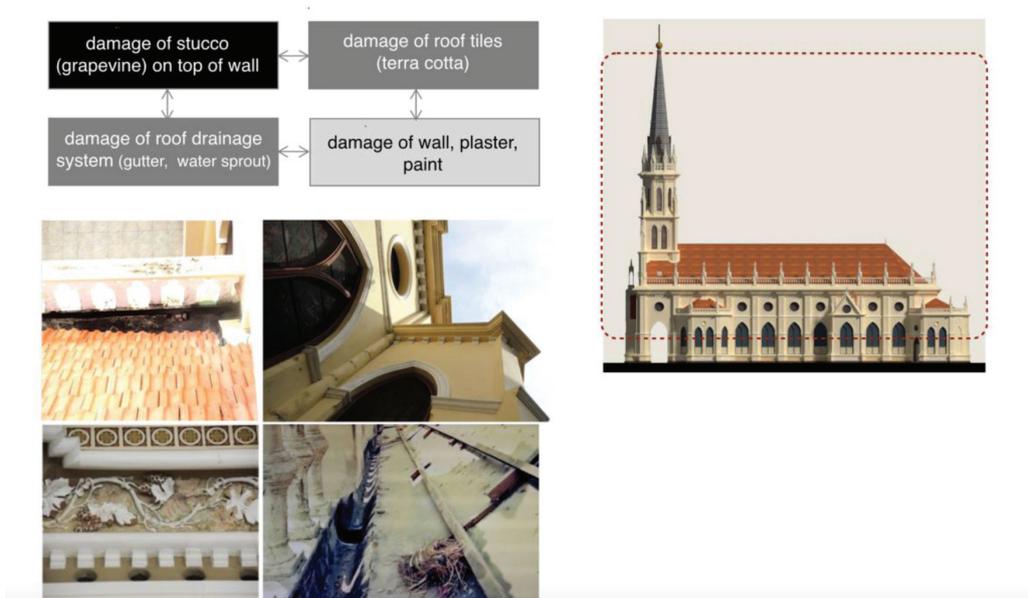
Group A: The damages of the roof drainage, roof tiles, interior and external walls, and wall decorations
